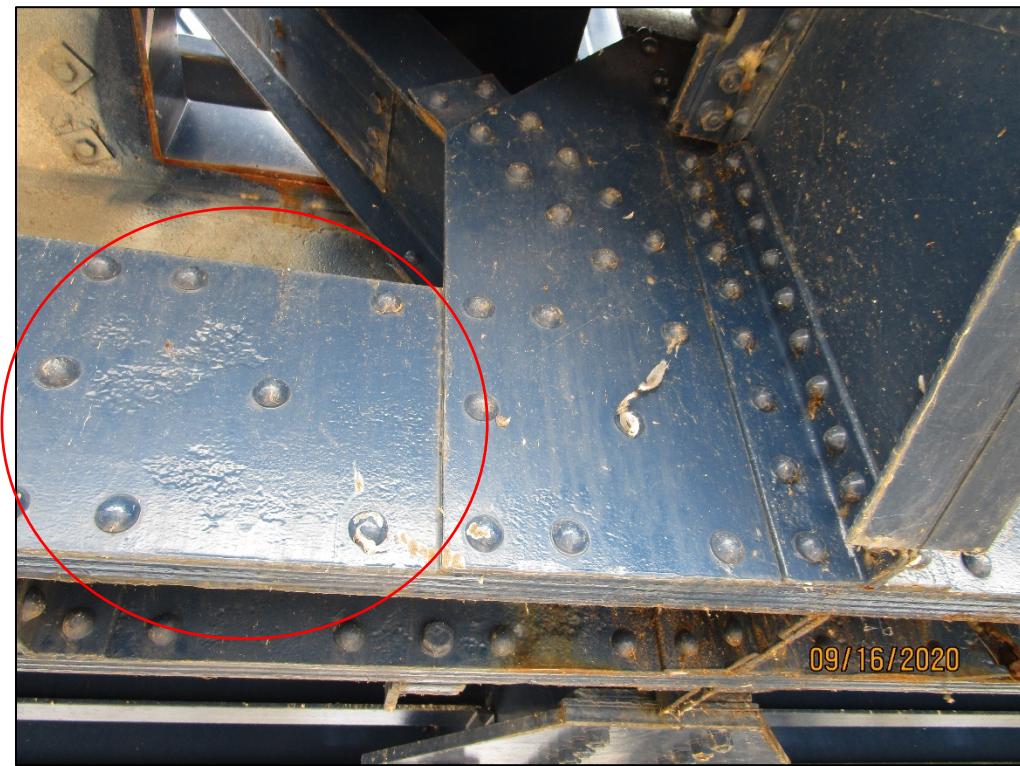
TYPICAL LOWER CHORD PAINTED OVER PITTING
